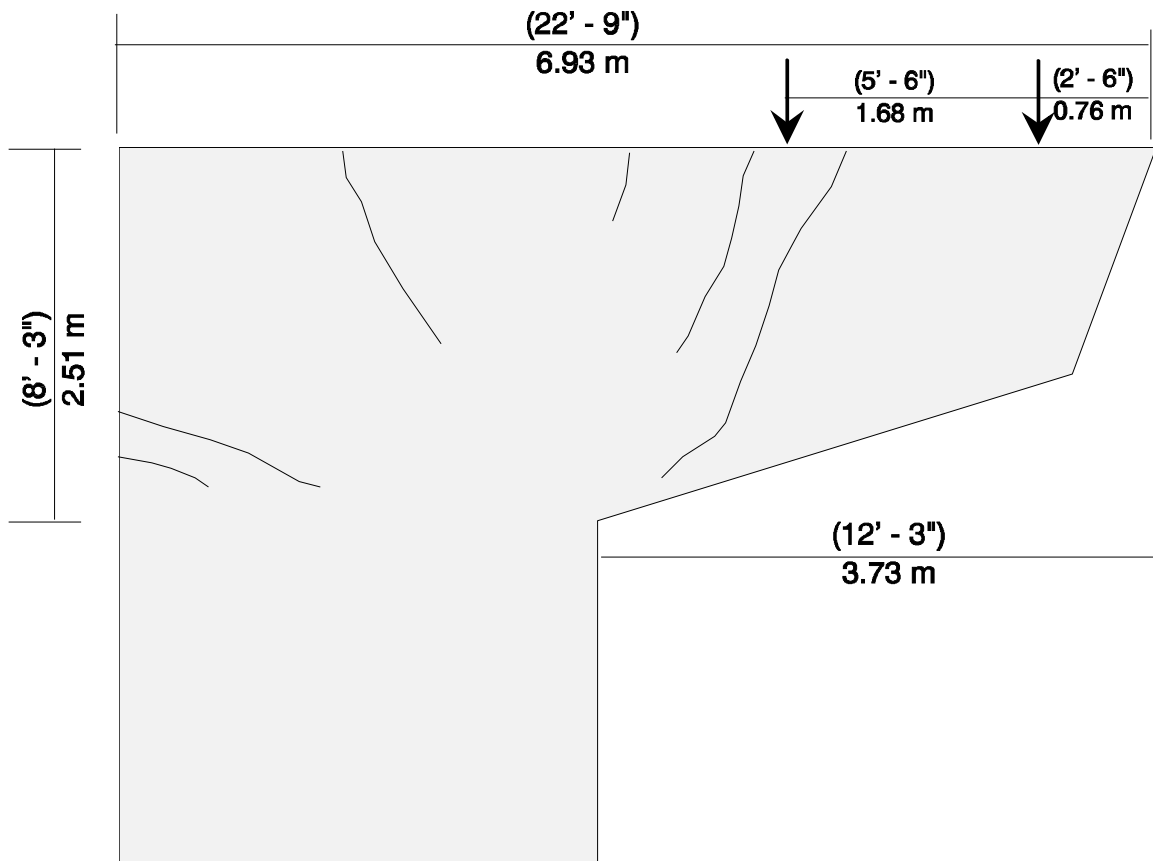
Pattern of Cracks in Pier I-4C
